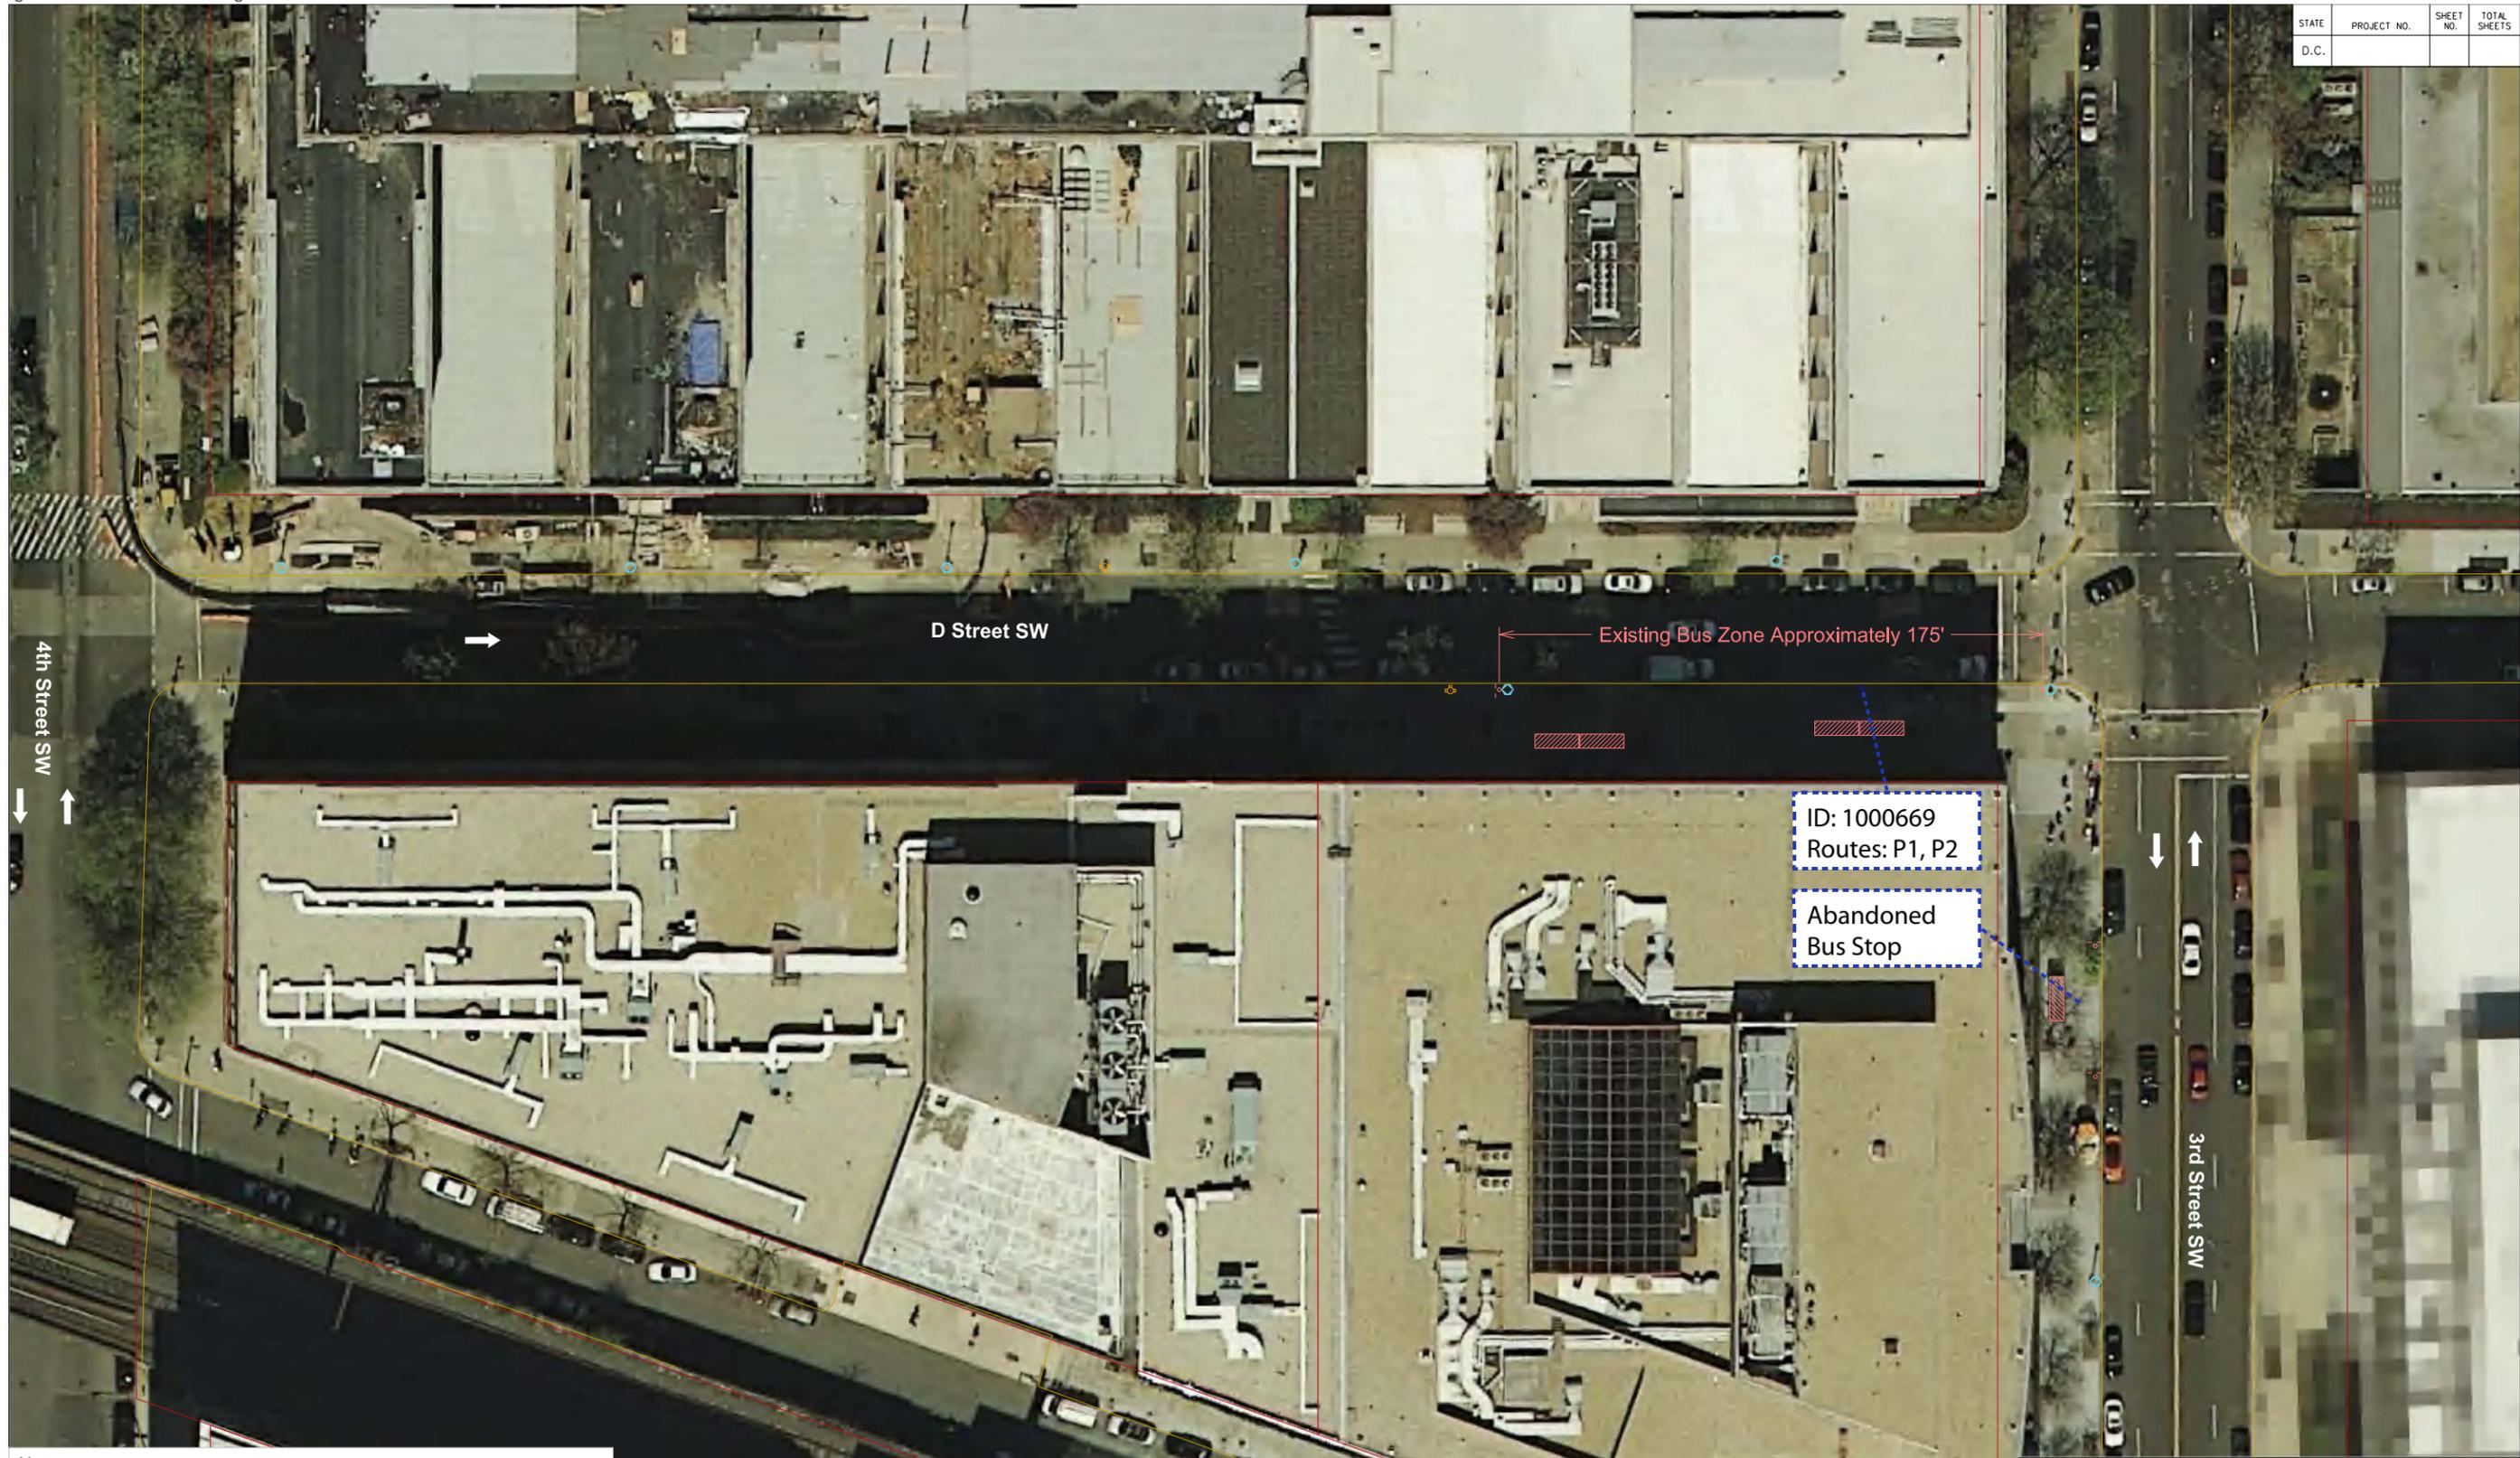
Foldout – Existing Conditions Plan View – Federal Center SW
